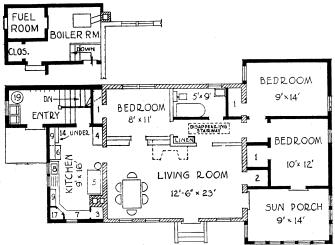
Alternate design for modernizing house 6, and further alternative to place boiler in rear entry.
